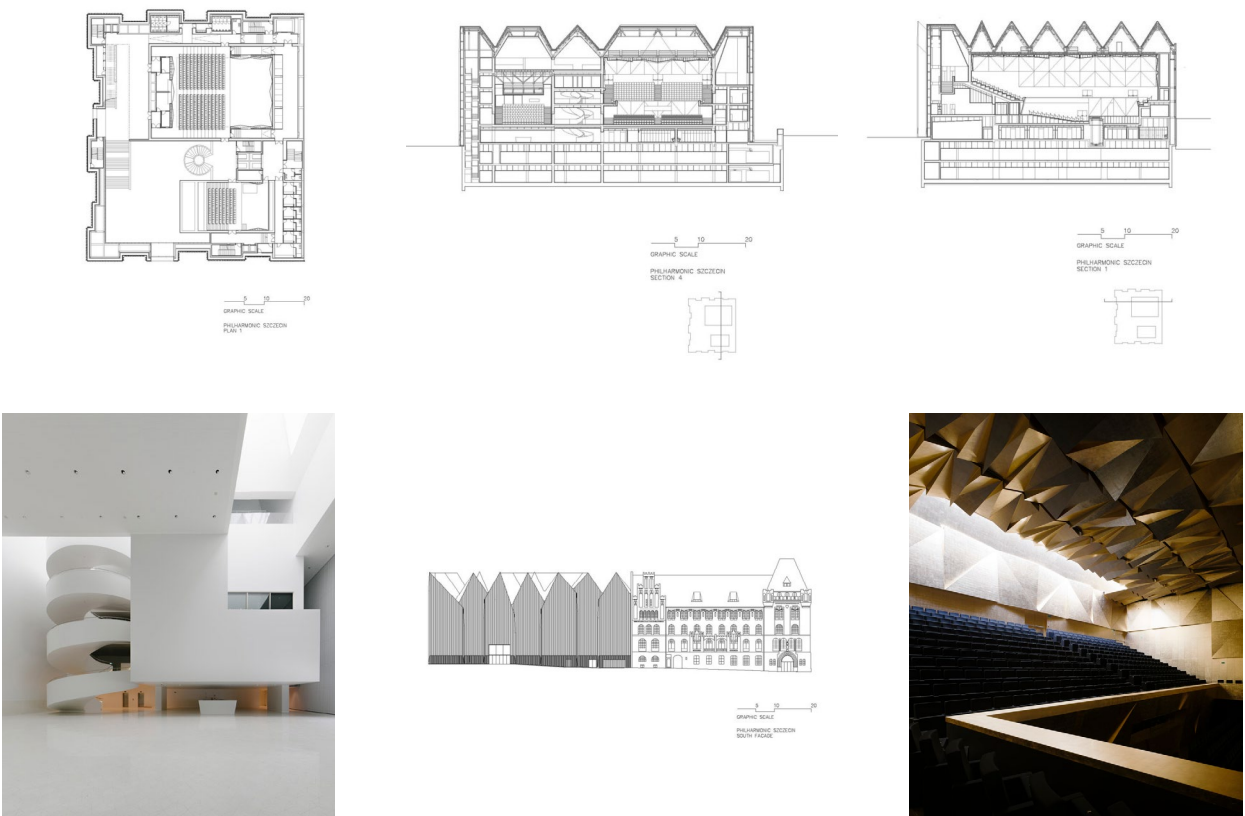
Plan, sections showing concert halls and main communication, interiors, and façade
